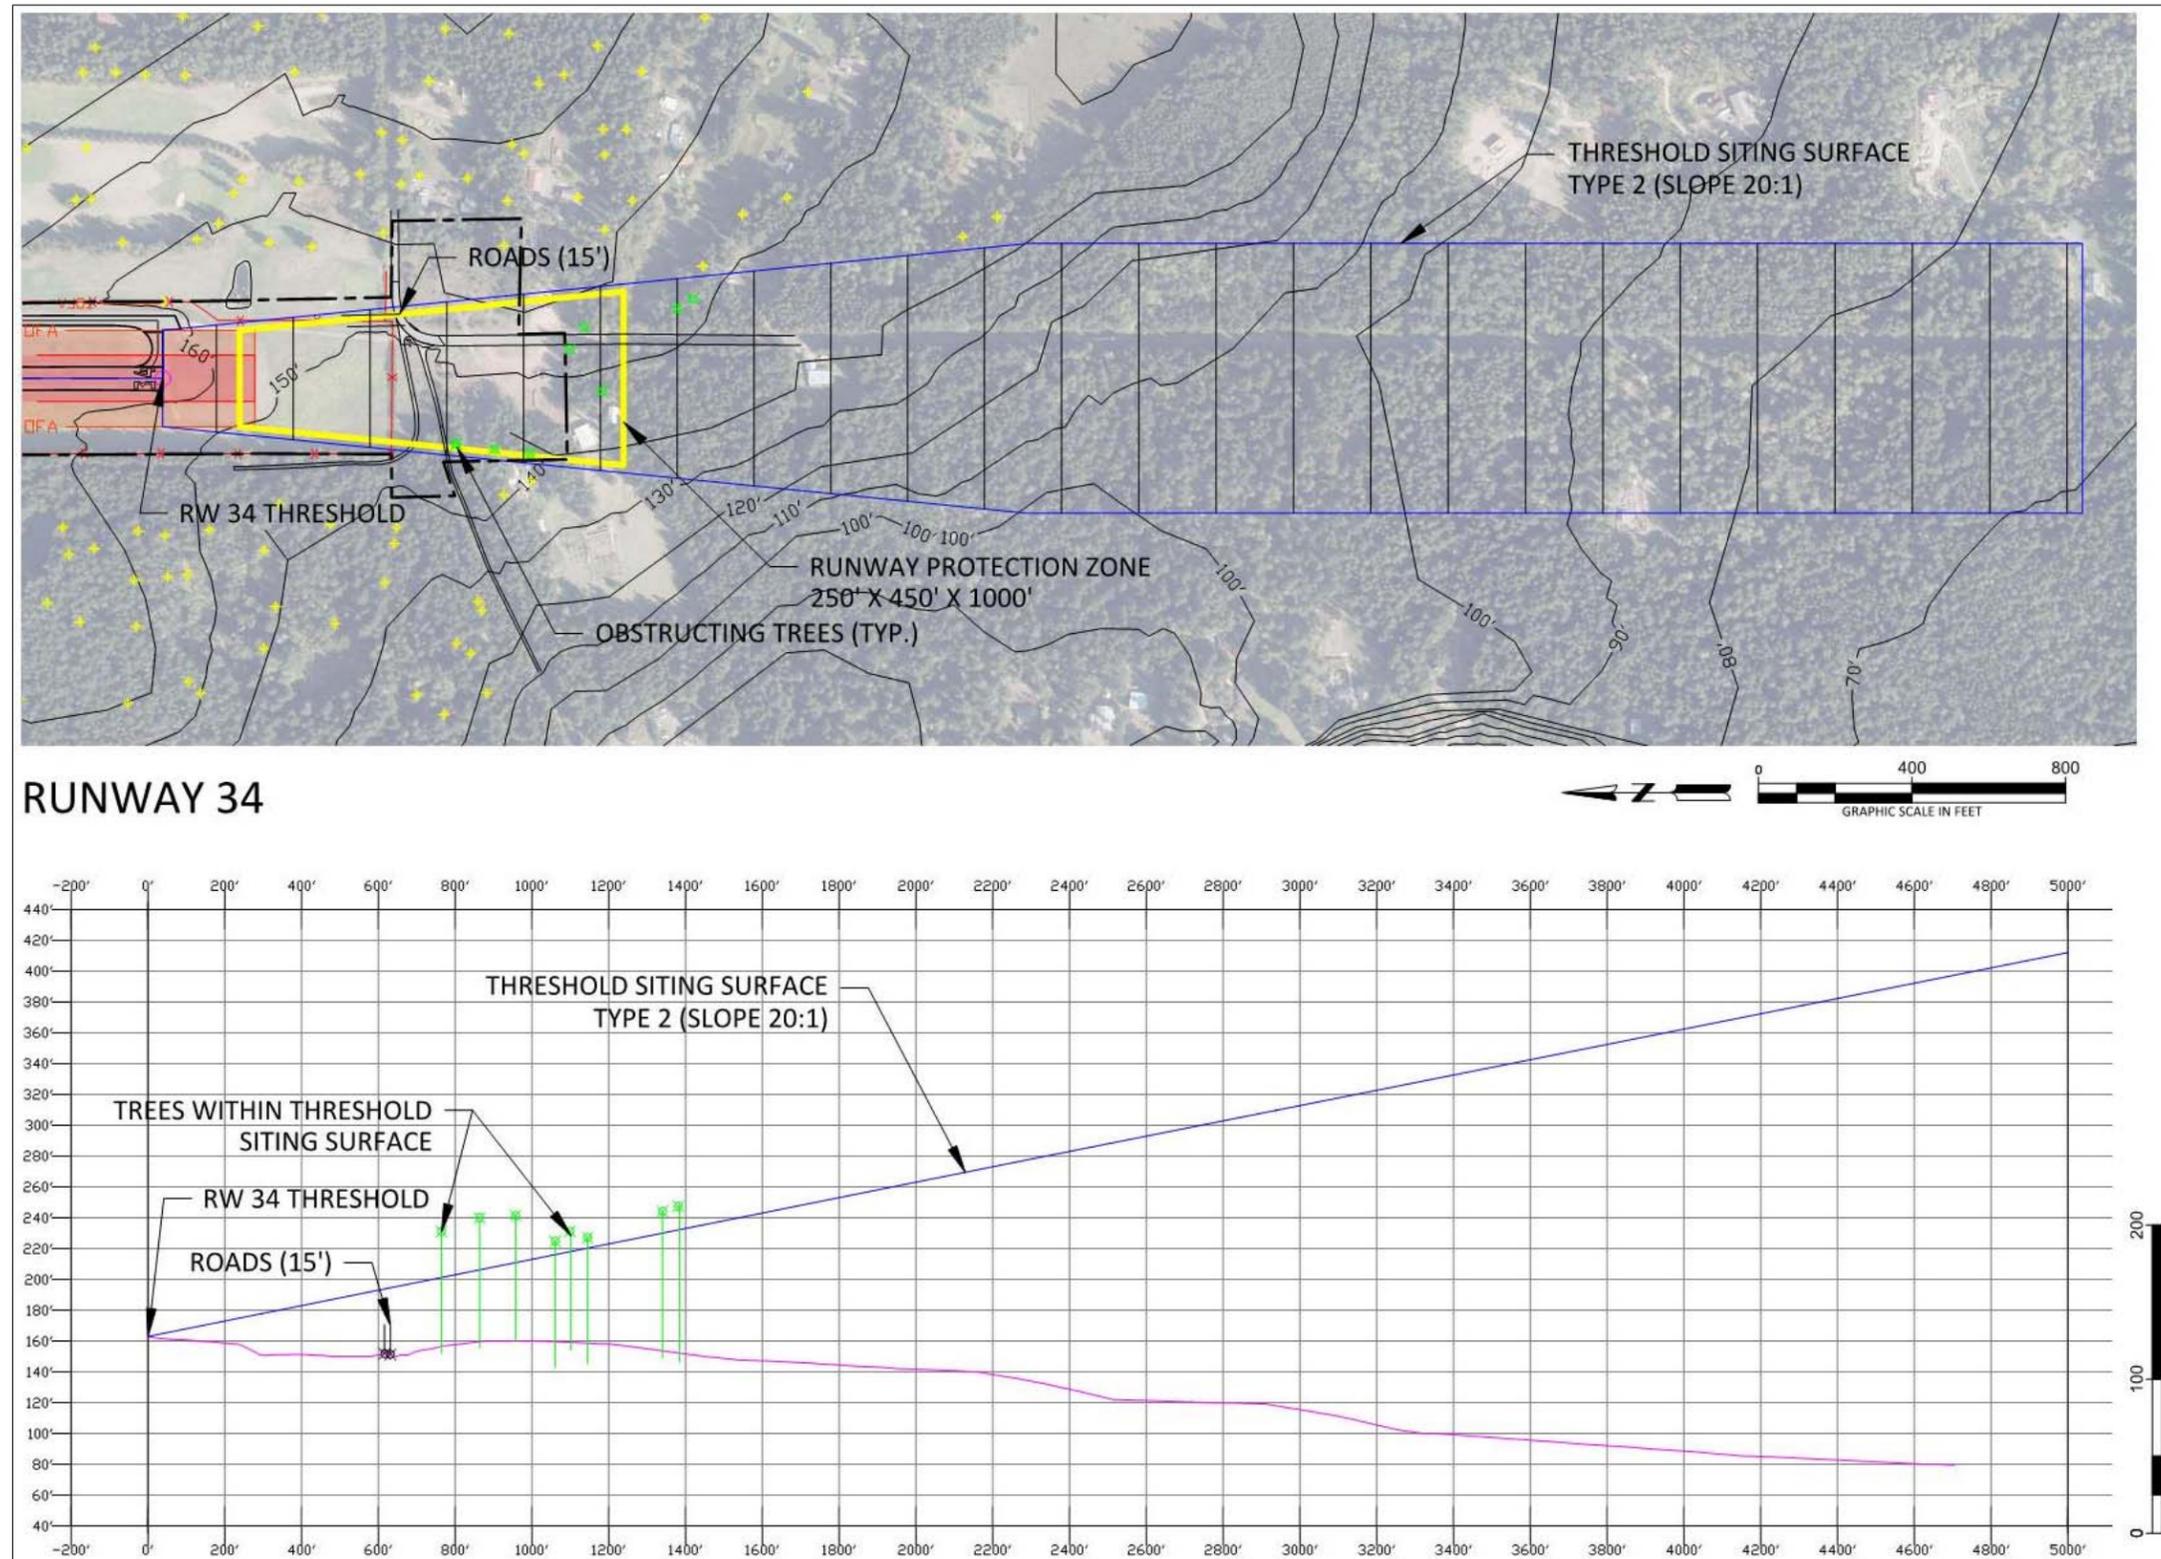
Runway 34 Threshold Siting Surface, Plan and Profile
